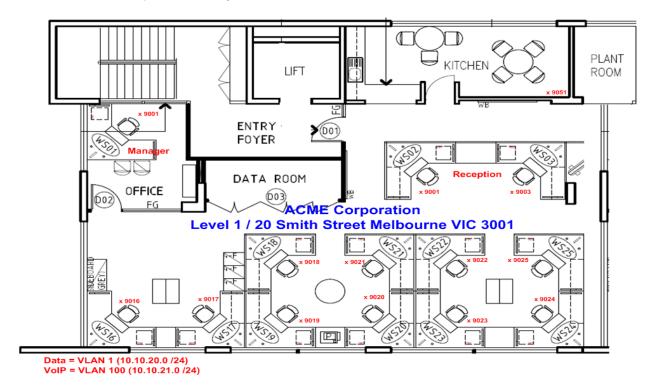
Detailed Floor Plan (IP Handset Installation)
